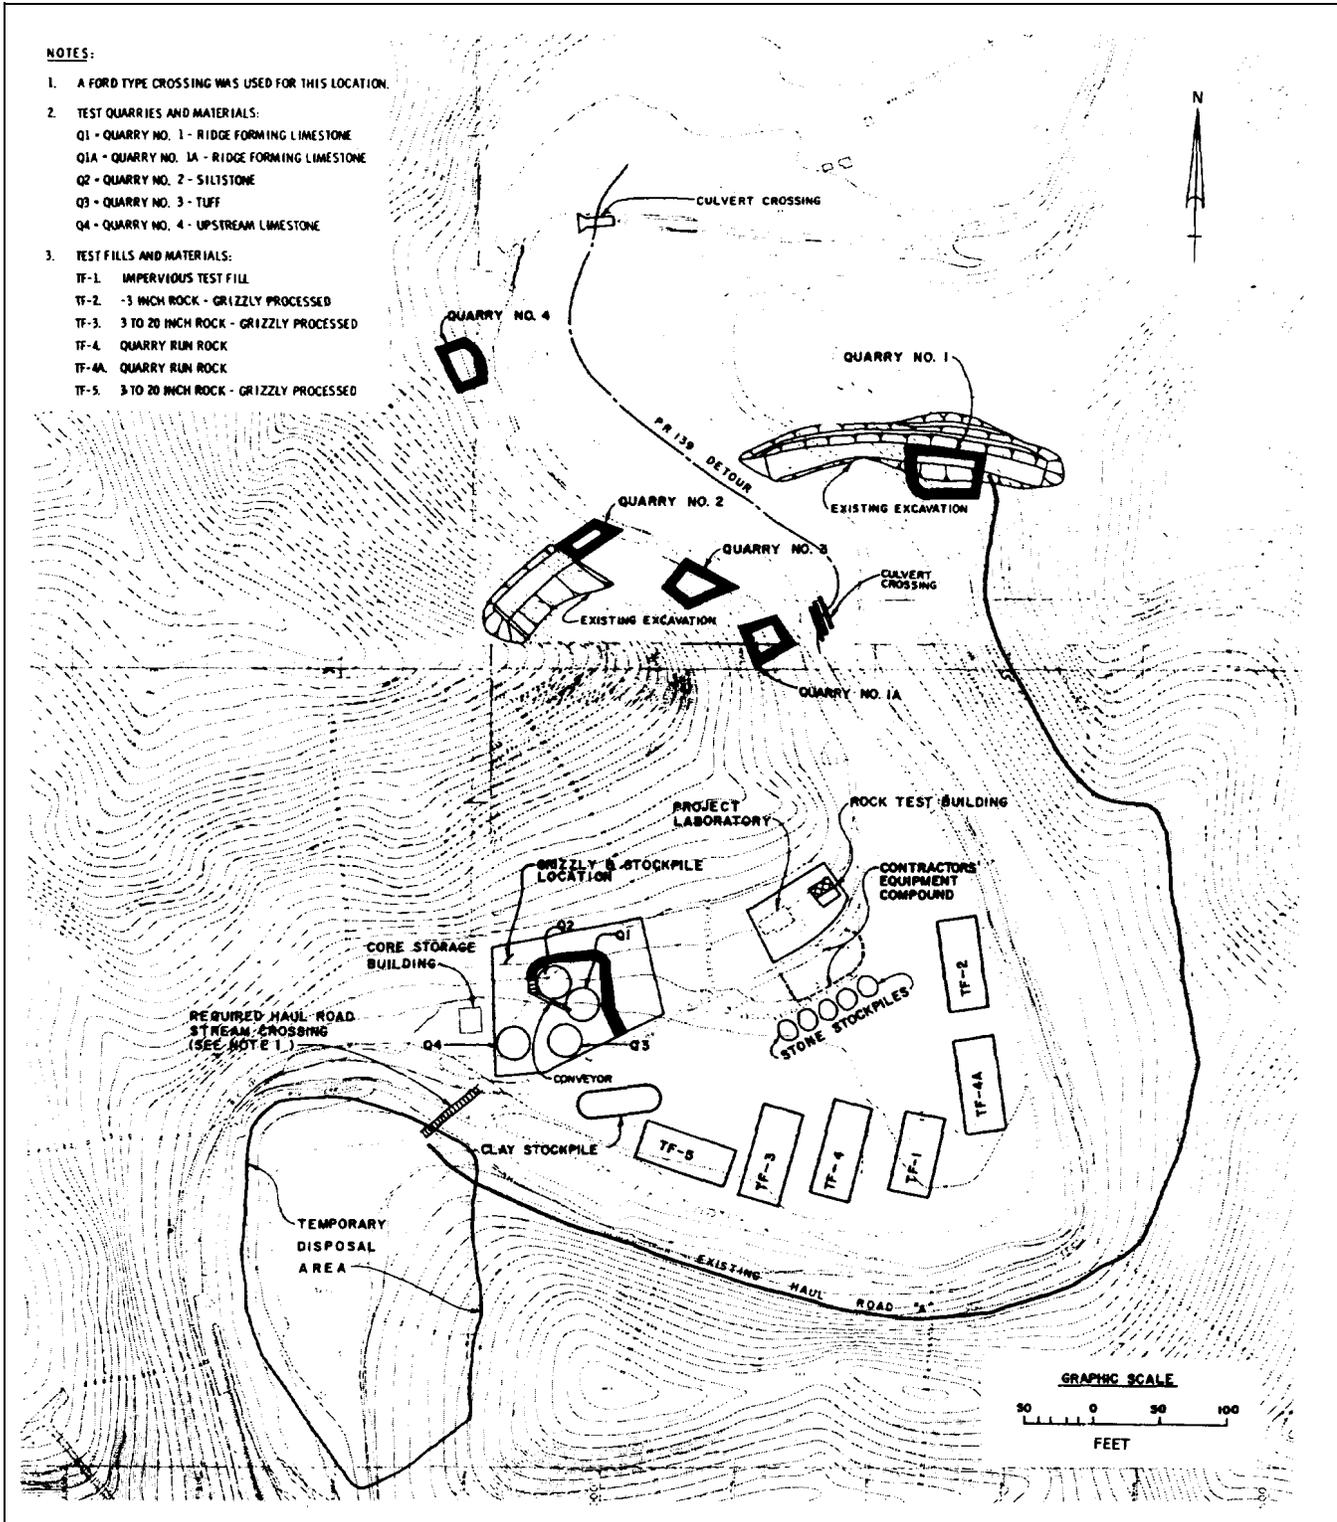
Example of a multiple test quarry layout where samples from several different rock strata are required for testing (after U.S. Army Engineer District, Jacksonville 1983)
